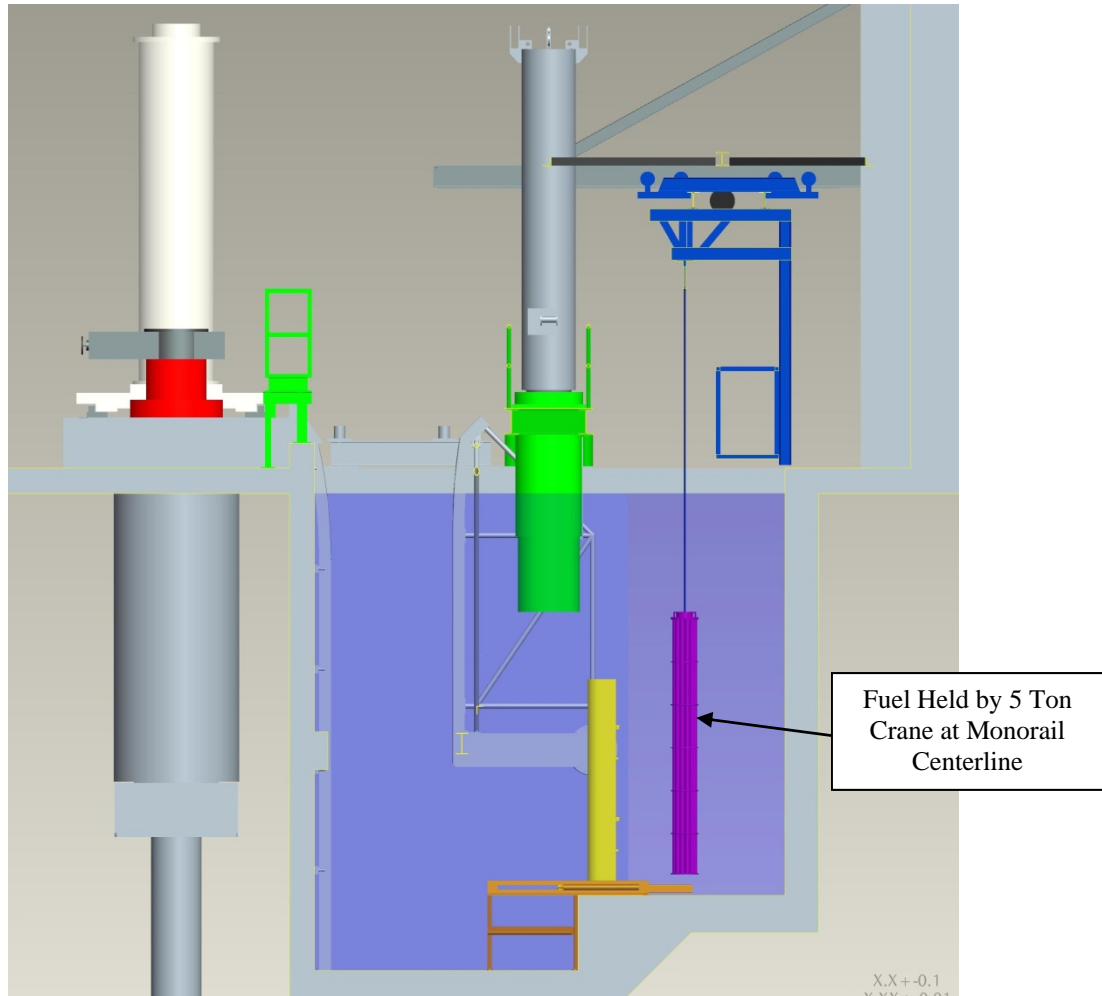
L-Basin Disassembly Area with Fuel Held by 5 Ton Crane
